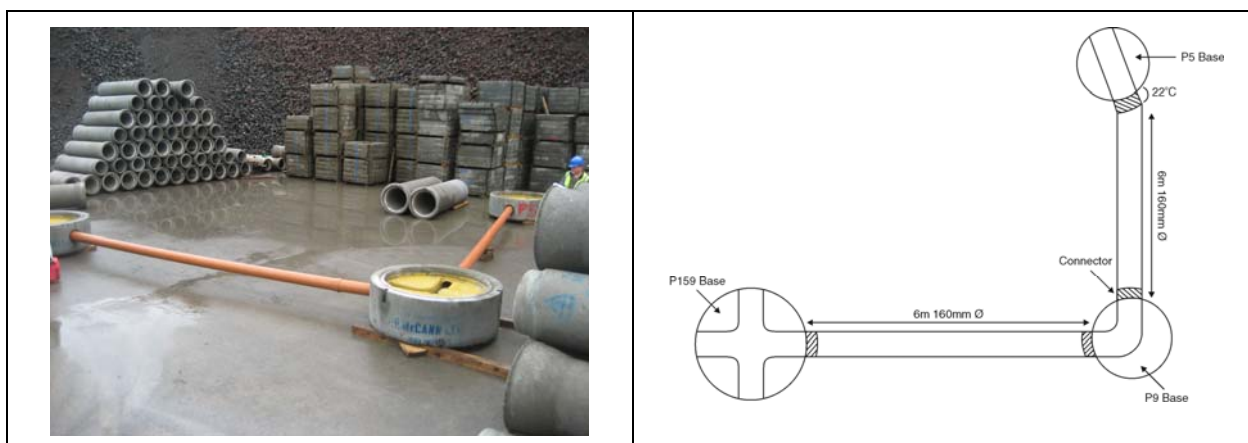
CCTV yard trial configuration photograph and schematic of manholes and pipe work
